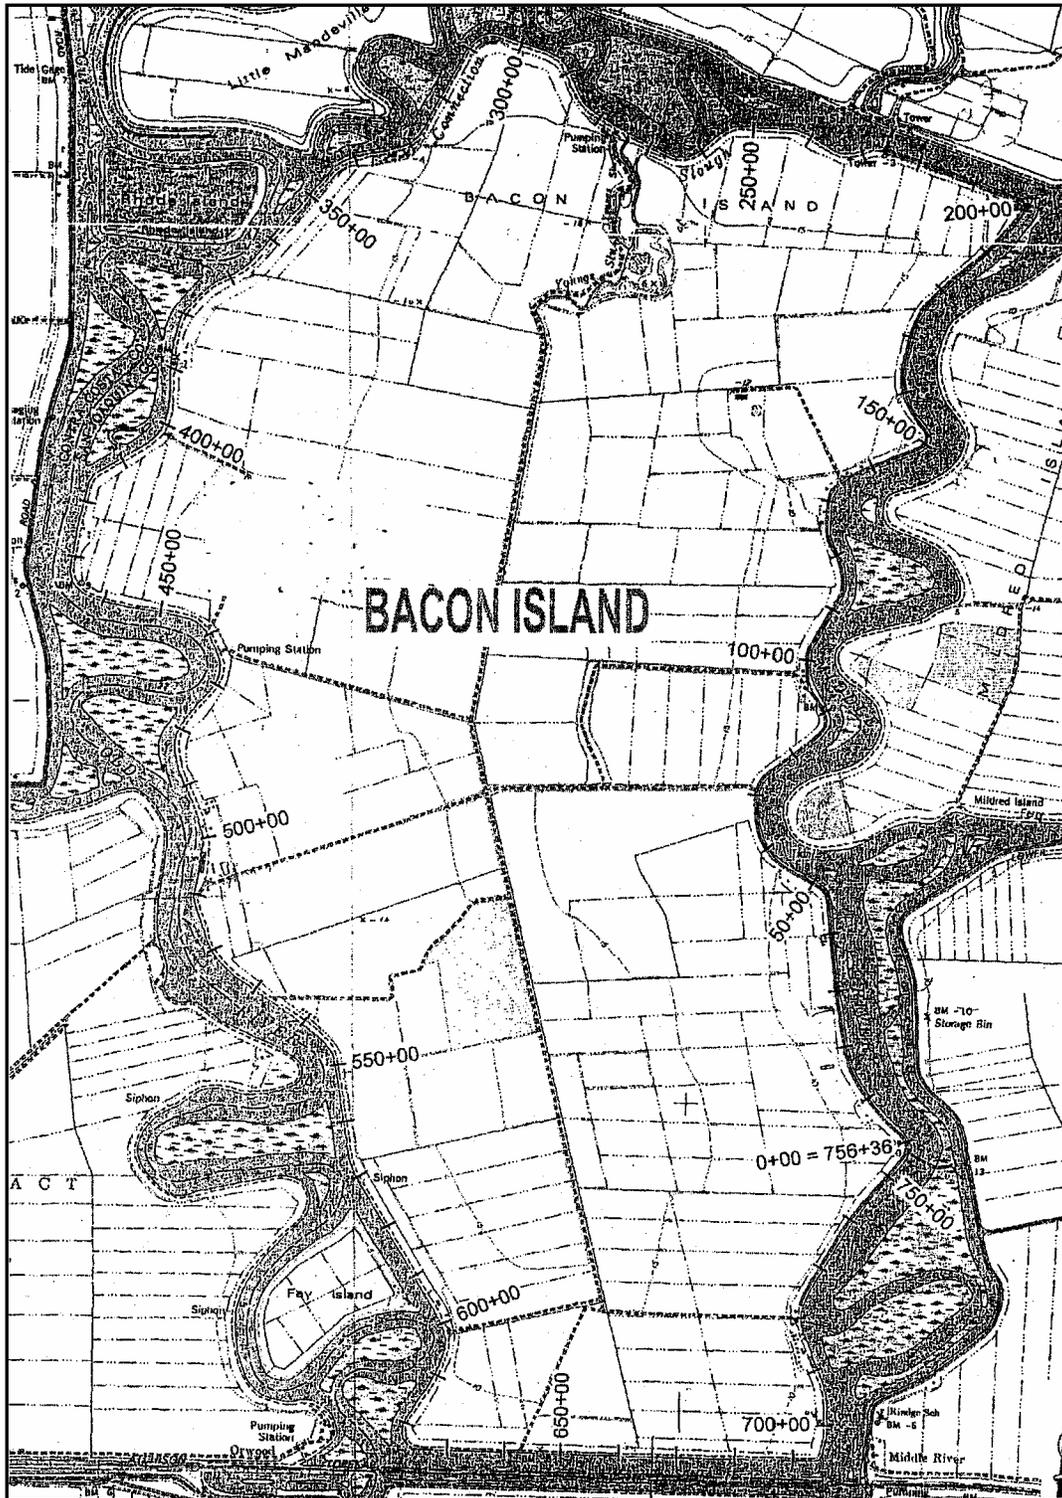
Embankment Stations at Bacon Island Reservoir
